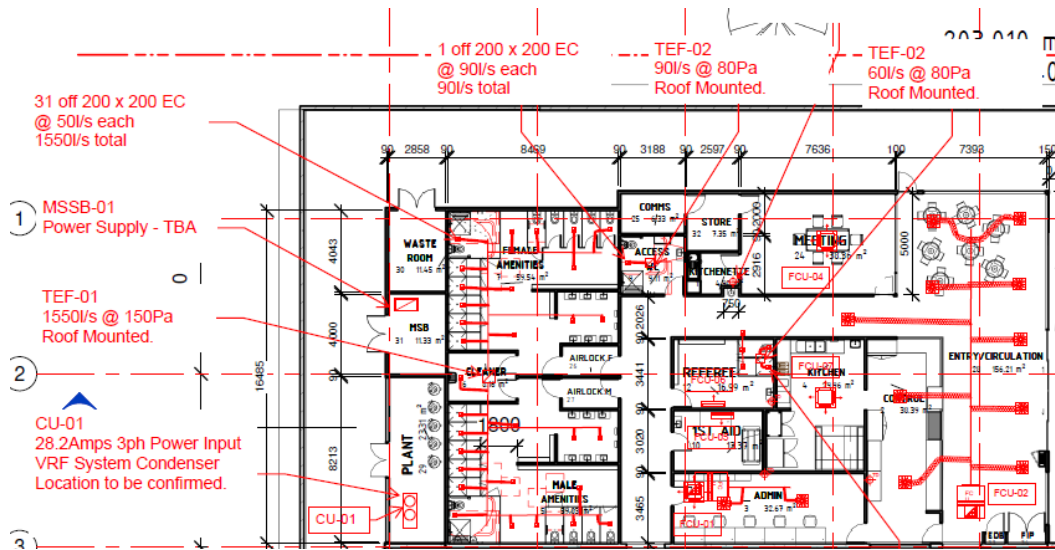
Layout Showing the Location of the Proposed Mechanical Plant to the Northwest of the Site. Source: The Facility Design Group.
